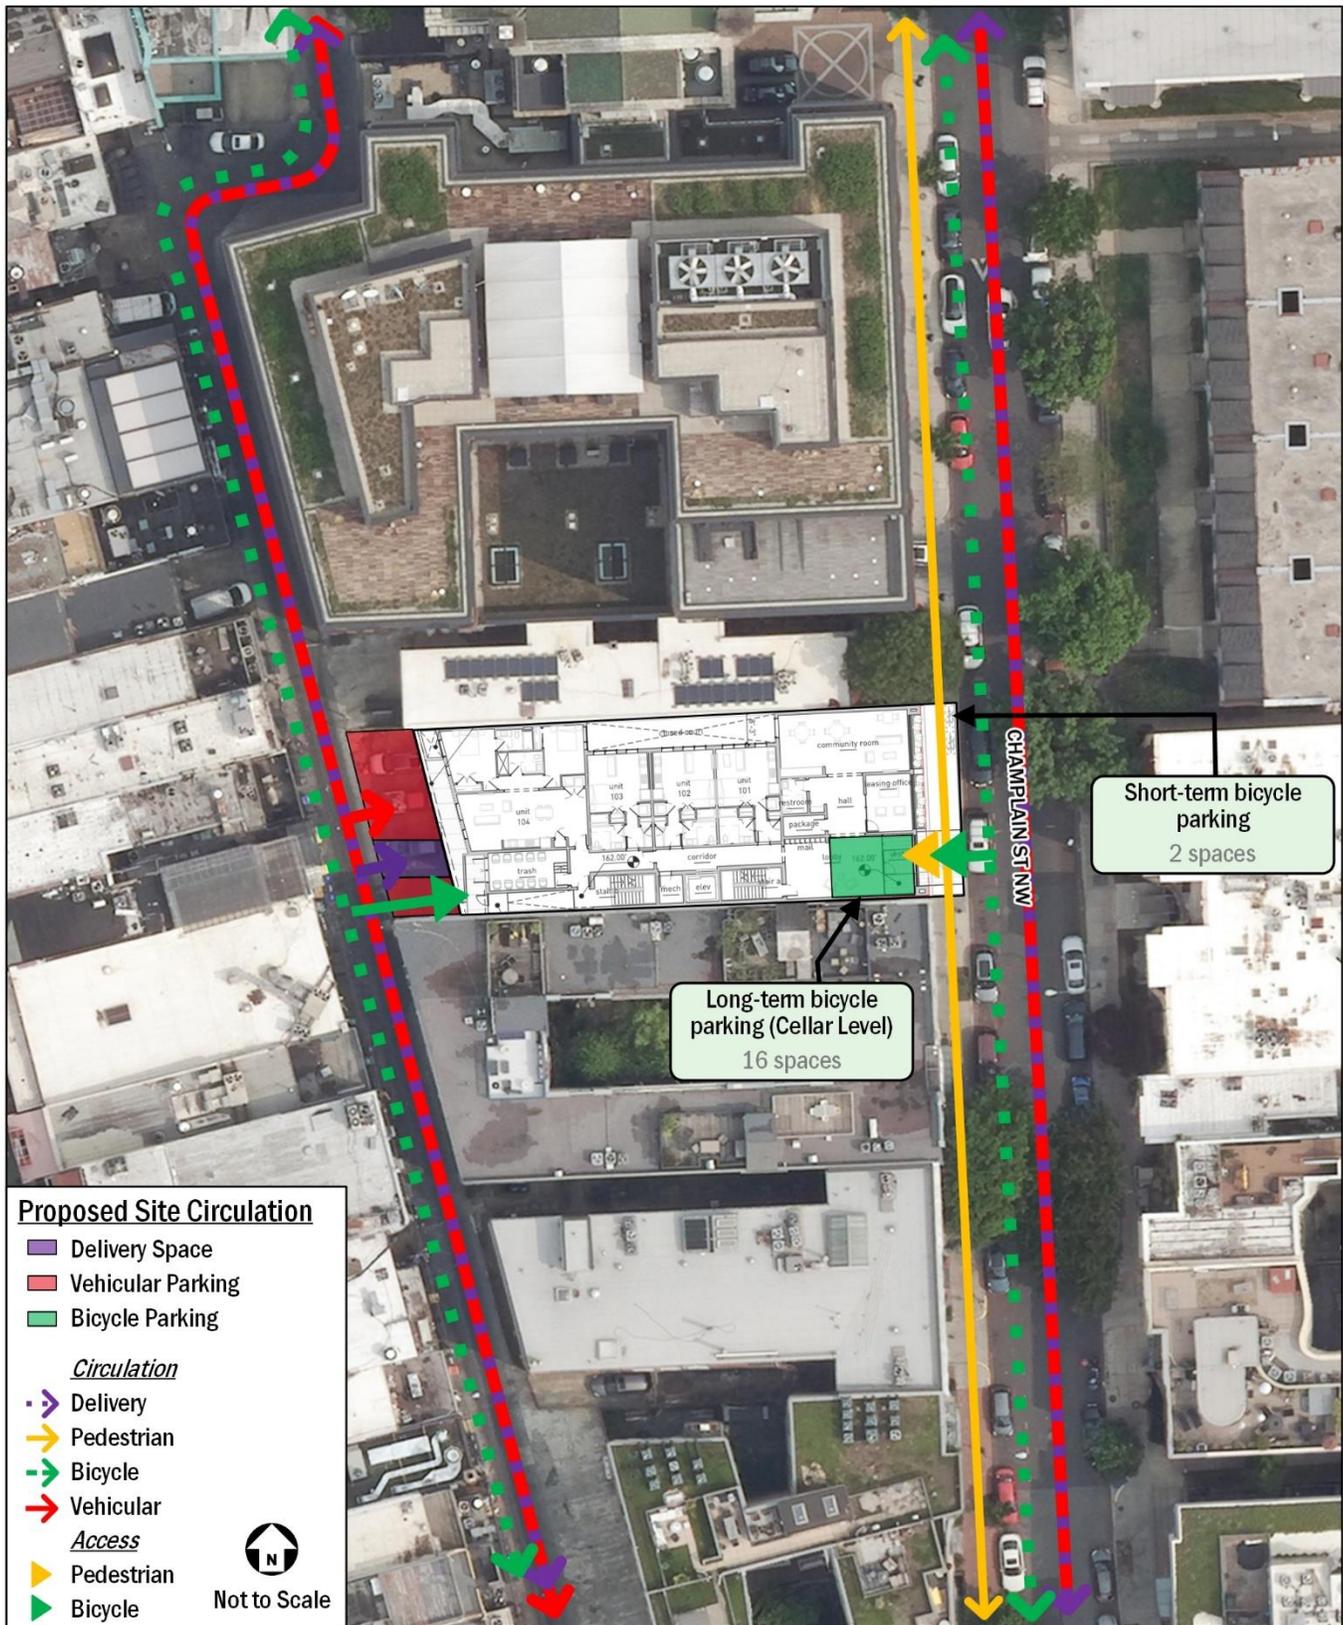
Proposed Site Plan & Anticipated Site Circulation
